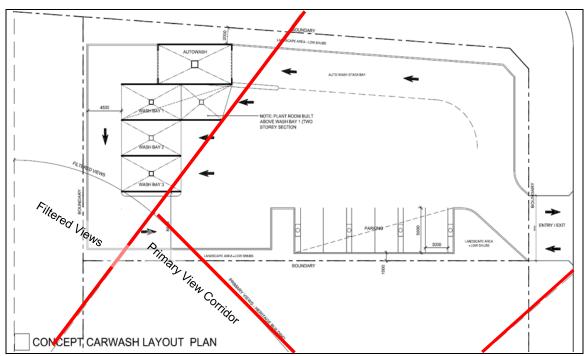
Concept Carwash Layout Plan (Source: Carwash Builders Australia)
